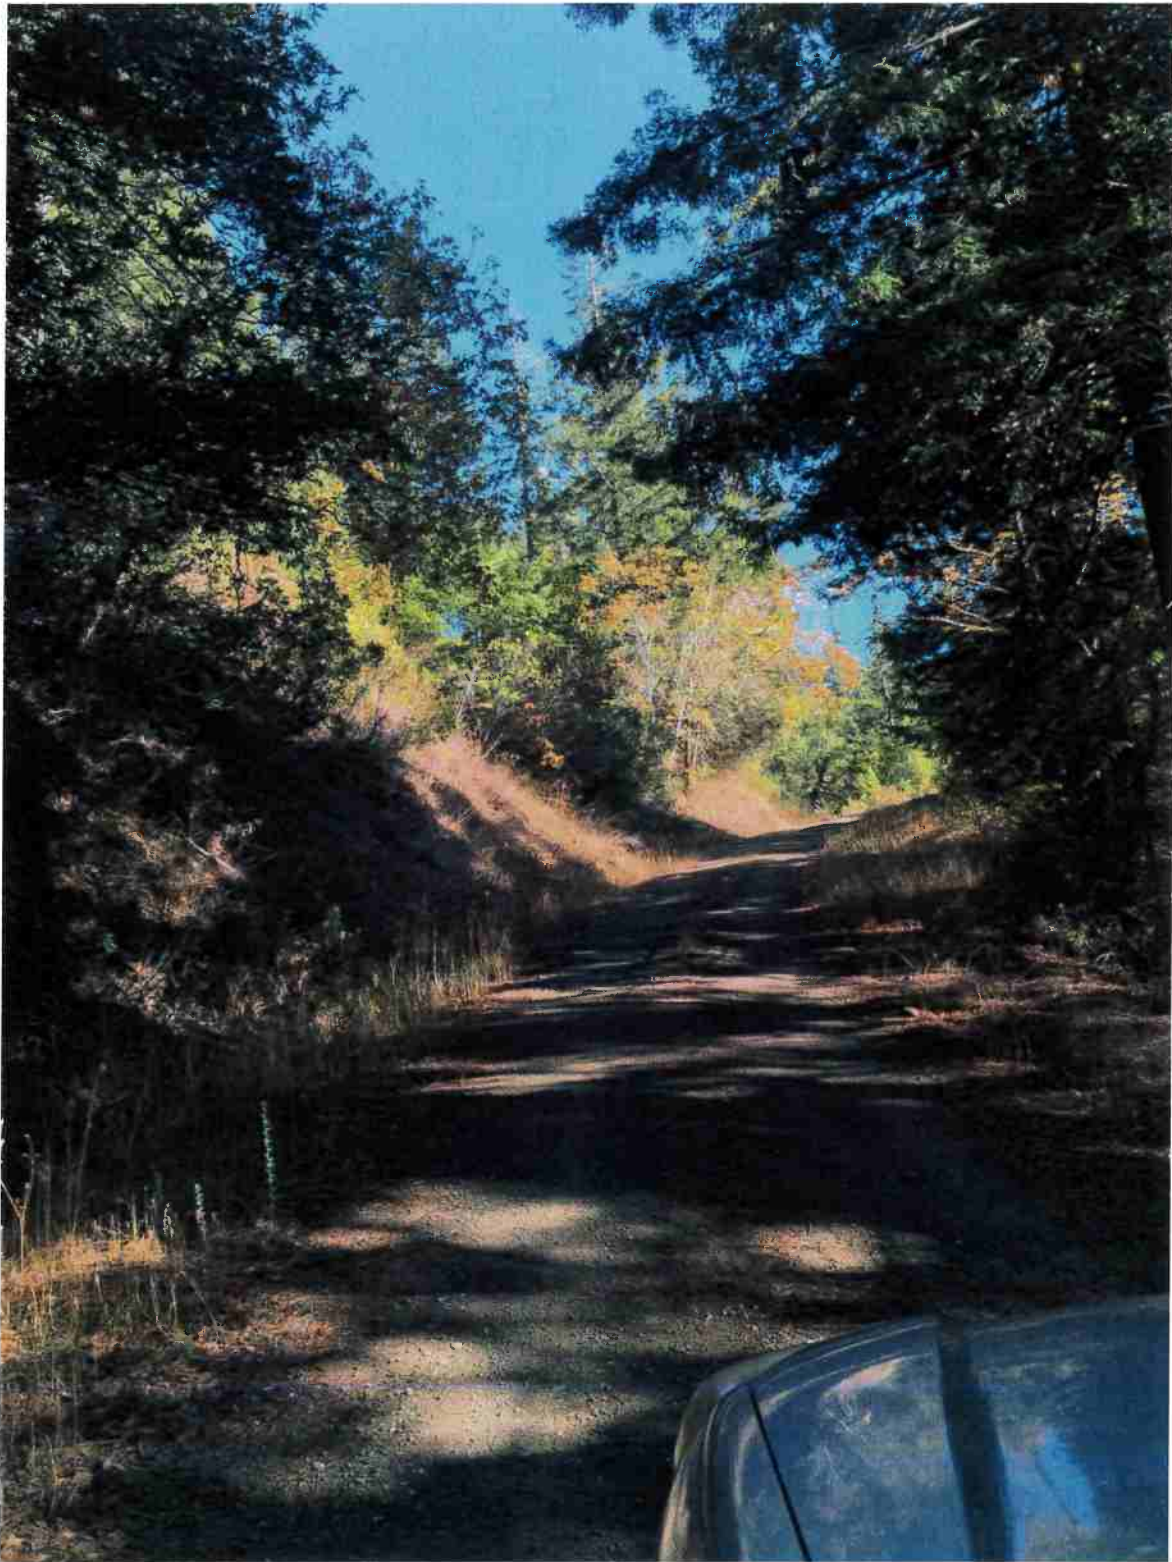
12'-wide travel way, limited shoulder, gravel surface, no inter-visible turn outs.
